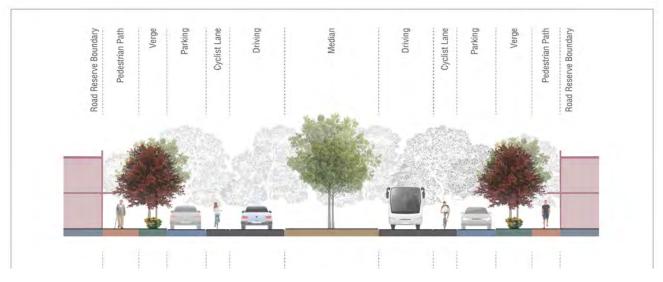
Road Cross Section - TOD Connector (Integrator B)
